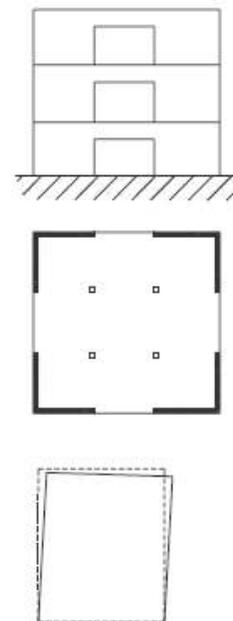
Elevation, plan and deformed shape of shear wall system (Szakats 2006)
